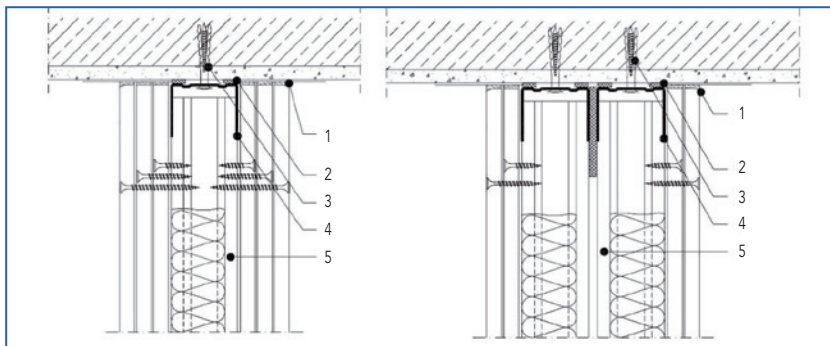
Details of joint of lightweight wall and floor from reinforced concrete. There is a steel plate inside partition wall (right) [10]
